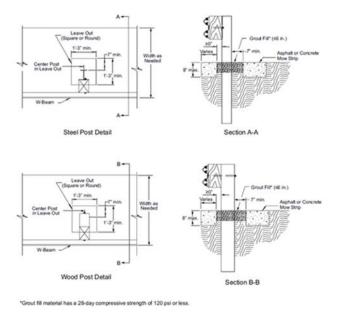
AASHTO RDG guardrail post detail in mow strip application (RDG 2011).
